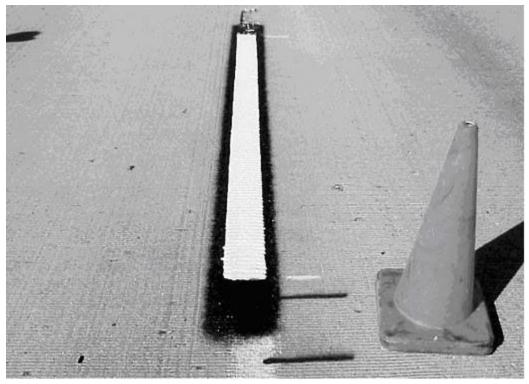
Typical bordered-contrast pavement marking for lane line.
